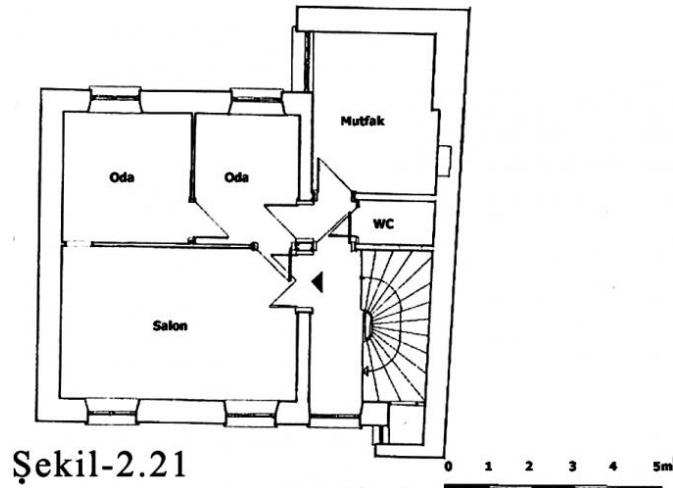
The plan of an apartment built between 1858 and 1872 (Source: Öncel, 2010)
